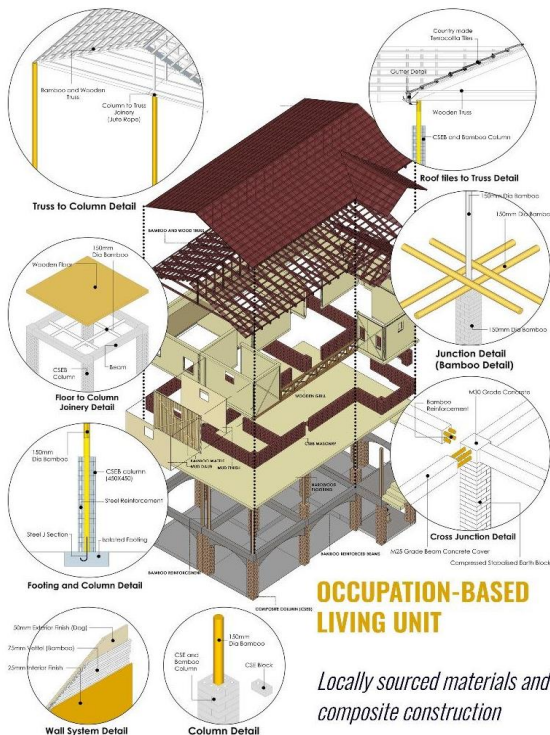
The proposed design, construction and material details for a typical 3-room occupation-based dwelling unit, which has adequate working space on the ground and first floors. The design incorporates locally sourced mud and bamboo with a composite construction technique.
